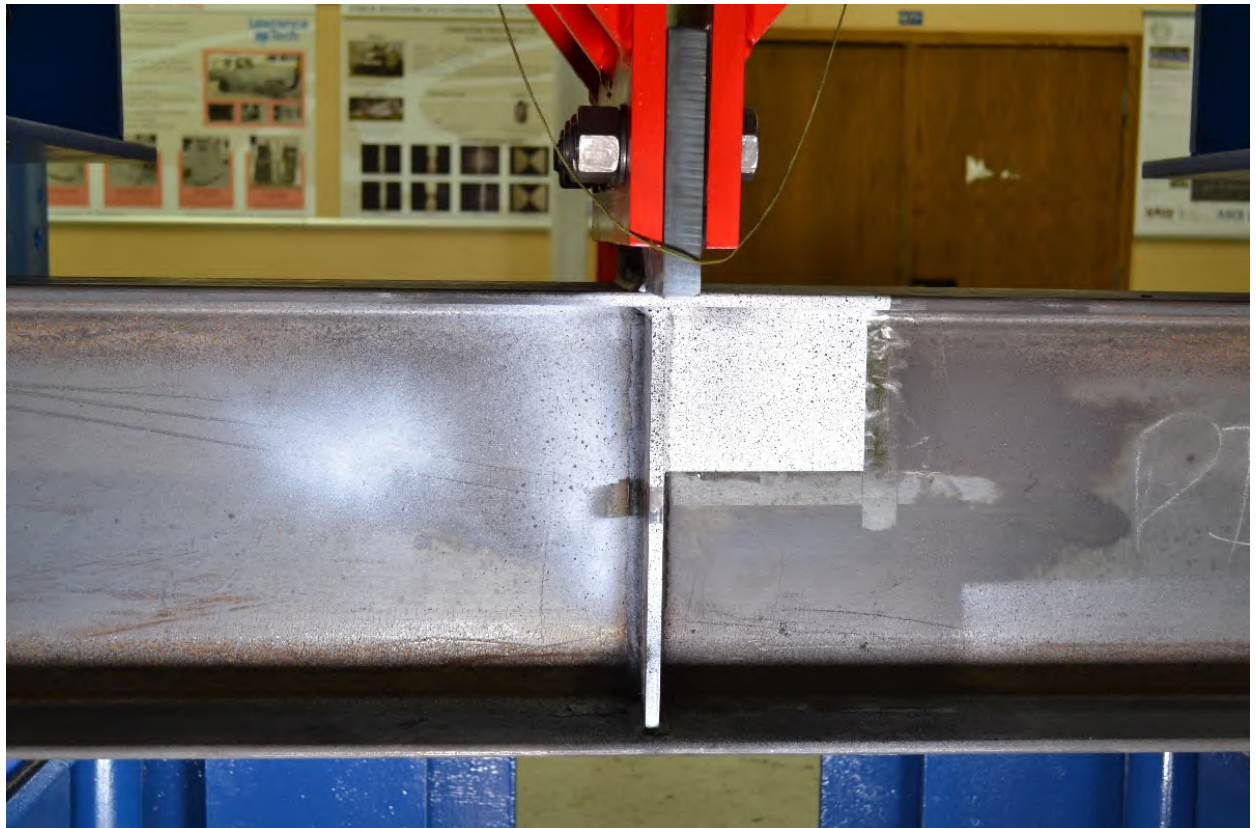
W12X26-ST-E2 after testing emphasizing web fracture
